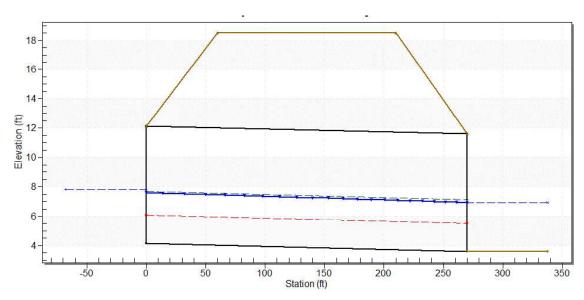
Proposed Culvert Profile at Q₅₀ (62cfs)
